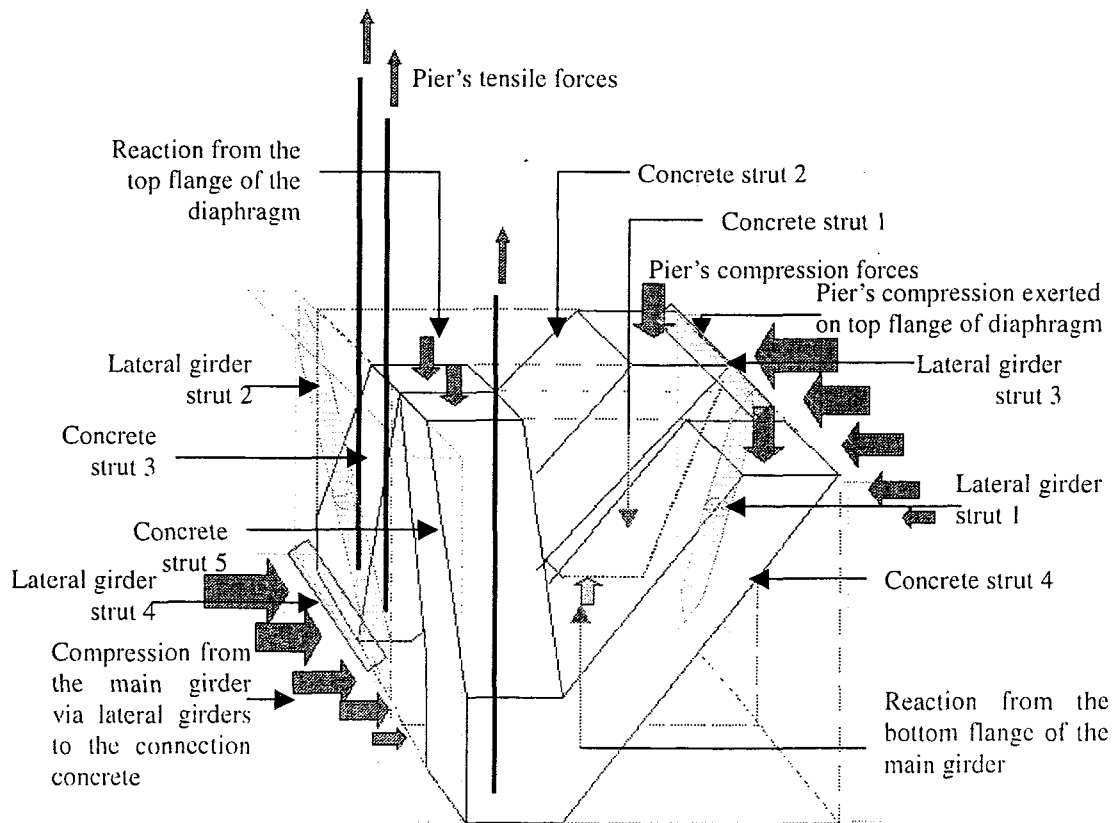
(a) Force transfer mechanisms inside the connection concrete of specimen C-4.
